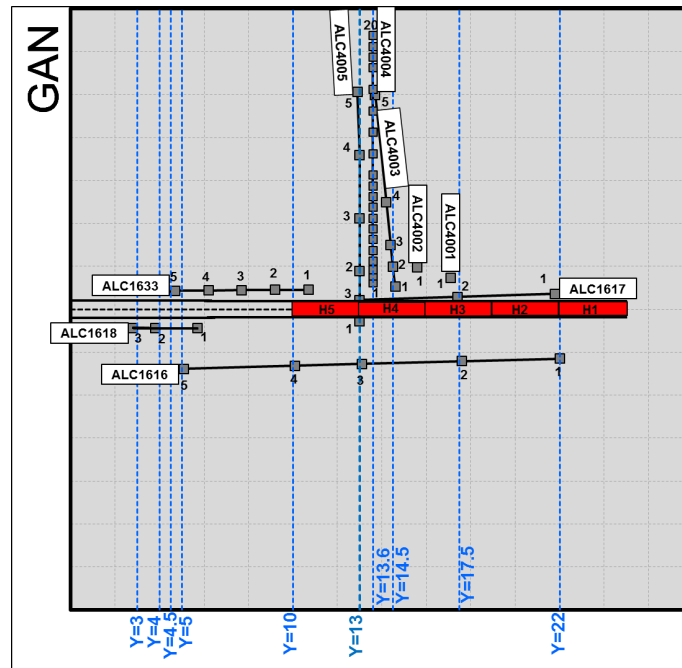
Horizontal cross-section of the instrumentation and alveolus arrangement.
